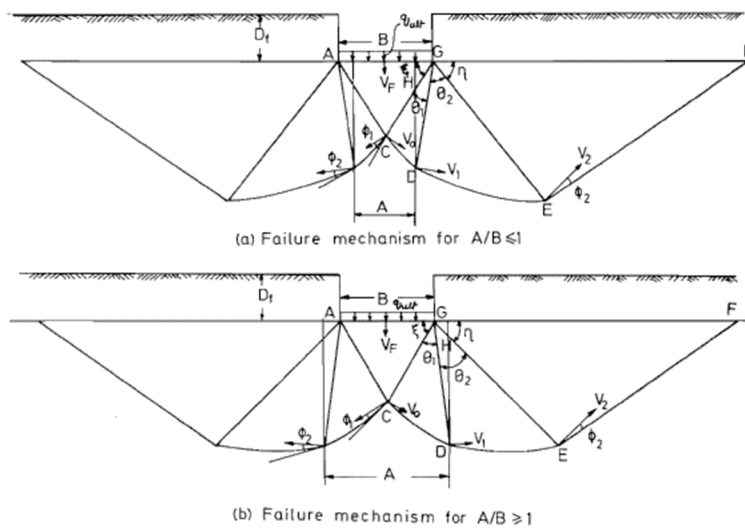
Failure mechanism of a trench of granular material under strip footing (Madhav et al., 1978)
